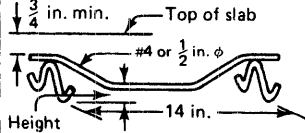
Placement of reinforcing steel. (Courtesy of Concrete Reinforcing Steel Institute)
